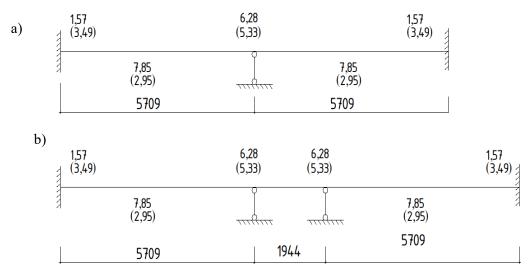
shows a comparison of the required reinforcement of the beam cross-sections obtained by calculation with the existing reinforcement.
